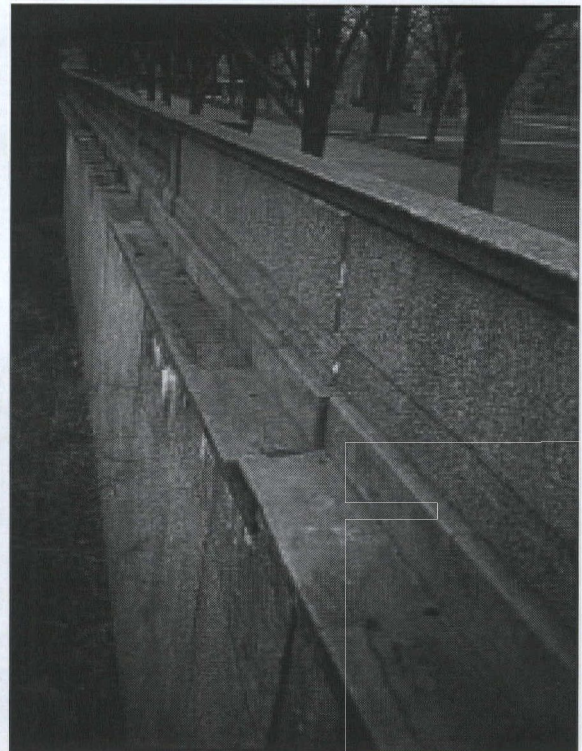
The high 16th Street retaining wall at the linden allee, 1997, (see plan sheet 28) showing location of possible continuing movement. See also figure 174 (Land Ethics, Inc.).
